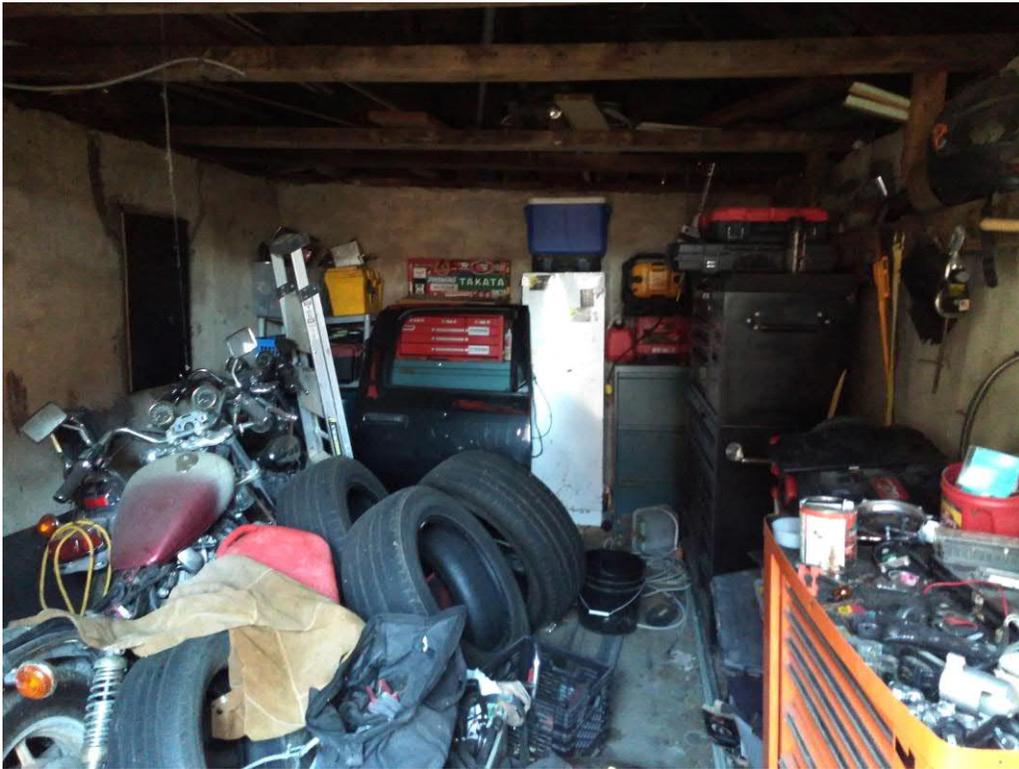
View of basement in 18 Elizabeth Street dwelling.
